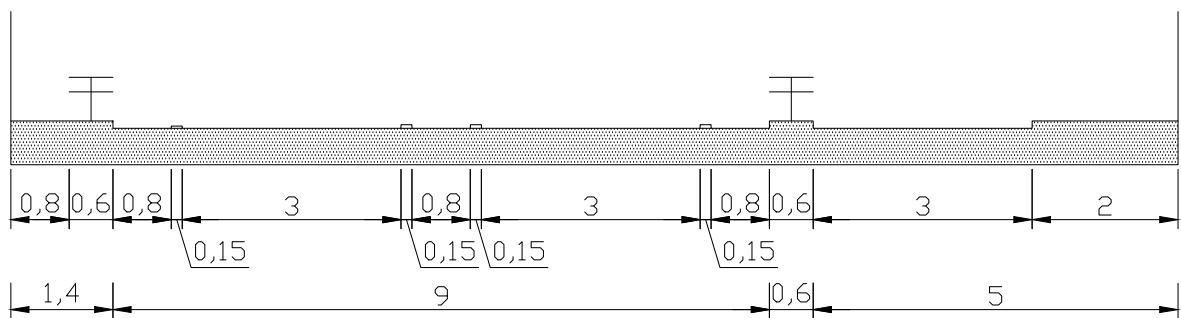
Schematic cross section of the road on the bridge with cycle- and footpath [m]
